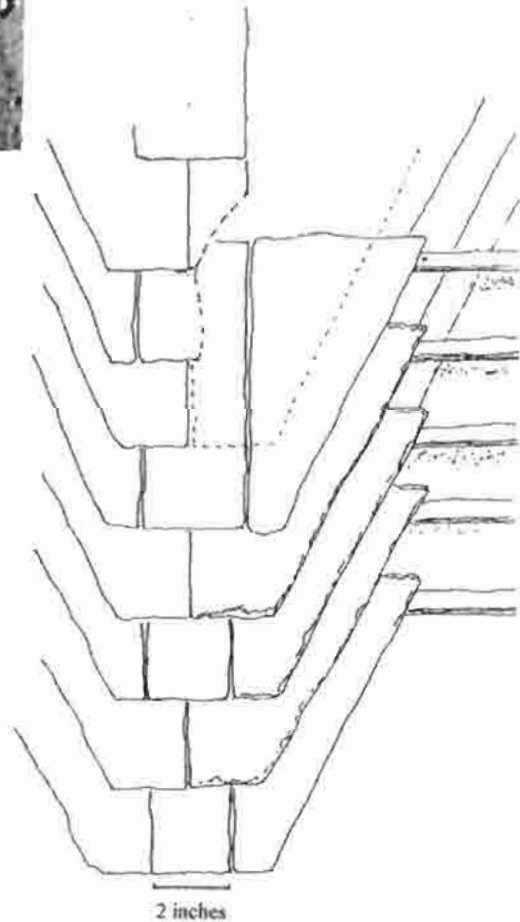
Plan of the valley slating, showing the narrow sidelap and triple headlap
